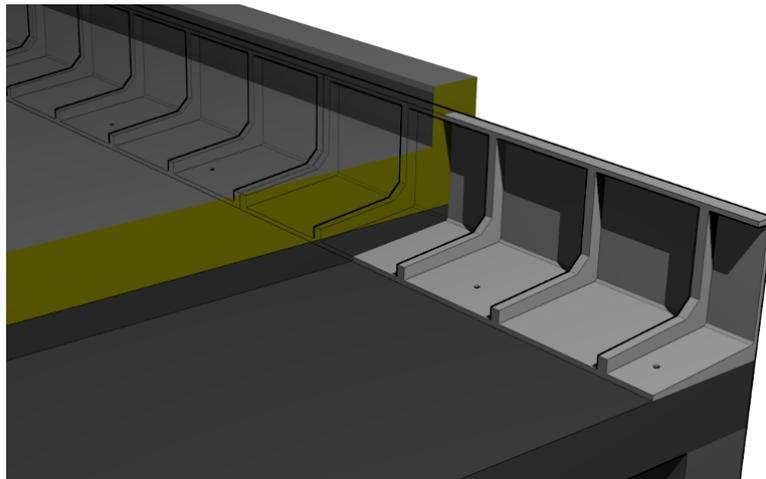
Installation of special shaped parapet block on the building (simplified visualization).
